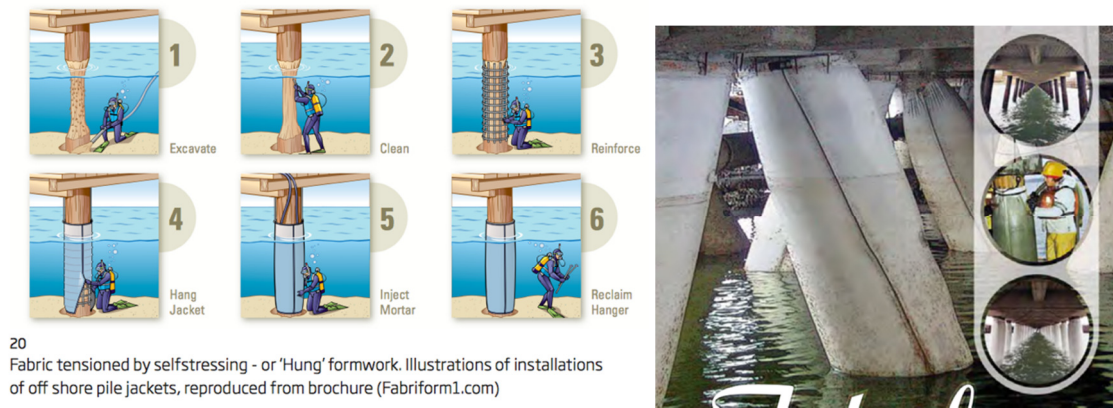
The fabric formwork – Ballistic Pile jacket is designed to allow corroded underwater piles to be repaired by introducing fabric sleeve to contain the concrete (taken from <http://www.fabriform1.com>).
